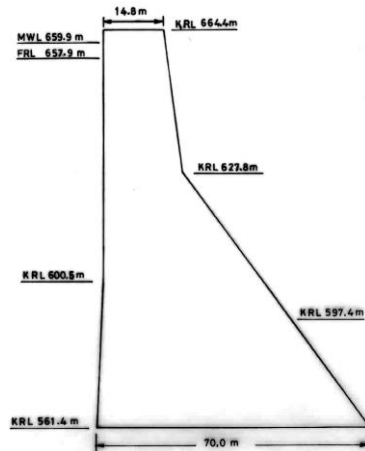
TYPICAL PLAN OF WITH SELECTED SECTIONS
